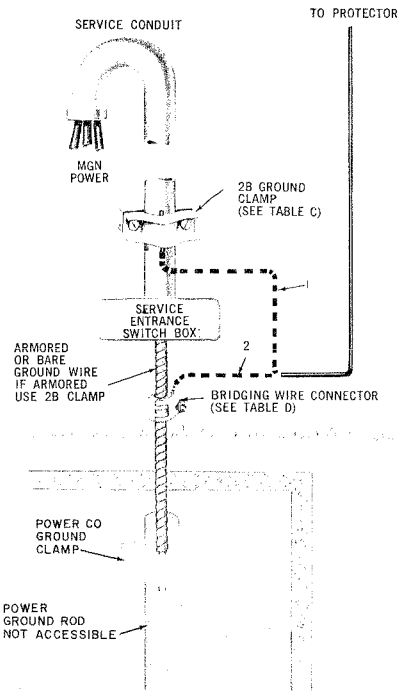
MGN Power Grounded to Inaccessible Ground Rod—No Water Pipe—Connection to Pipe Not Possible
